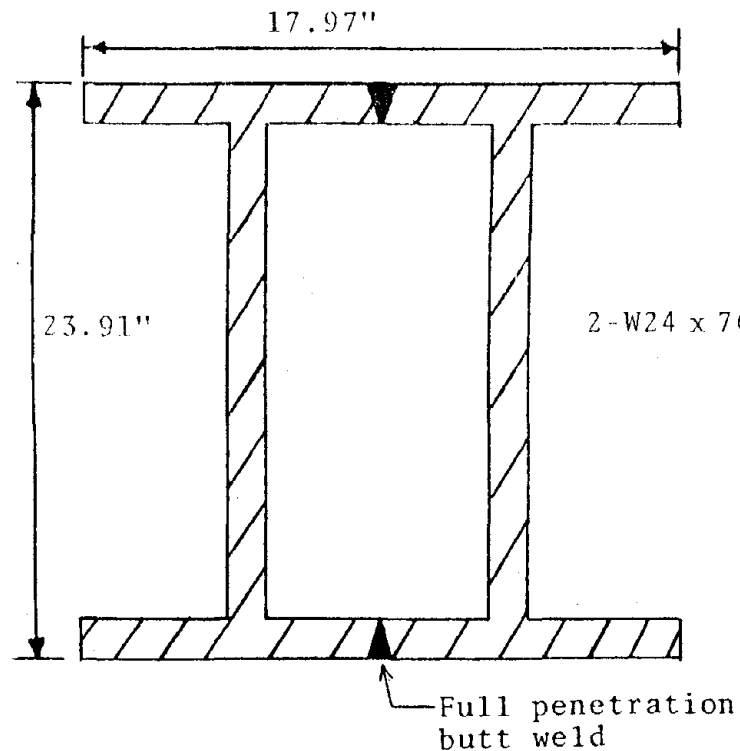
Cross section built from two wide flange shapes used in final design
